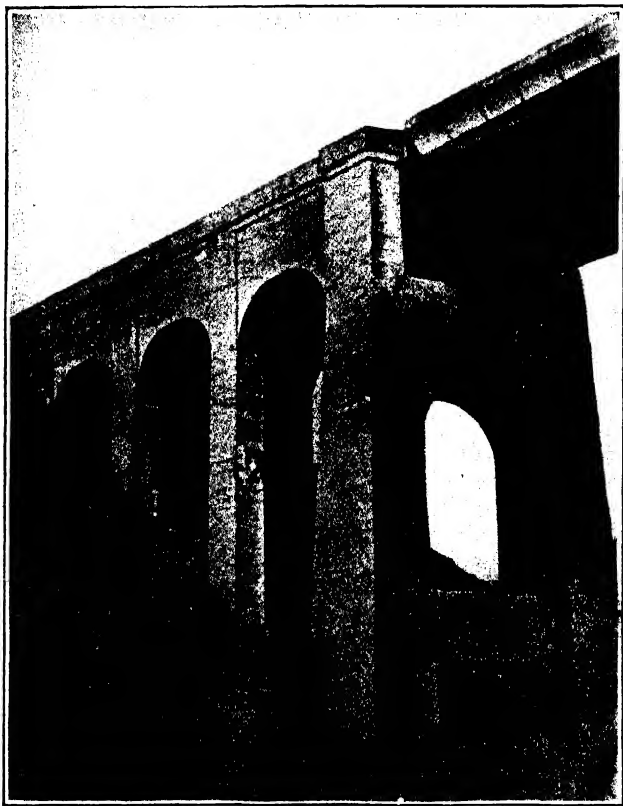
Trestle abutment, C. M. & St. P. Ry.
